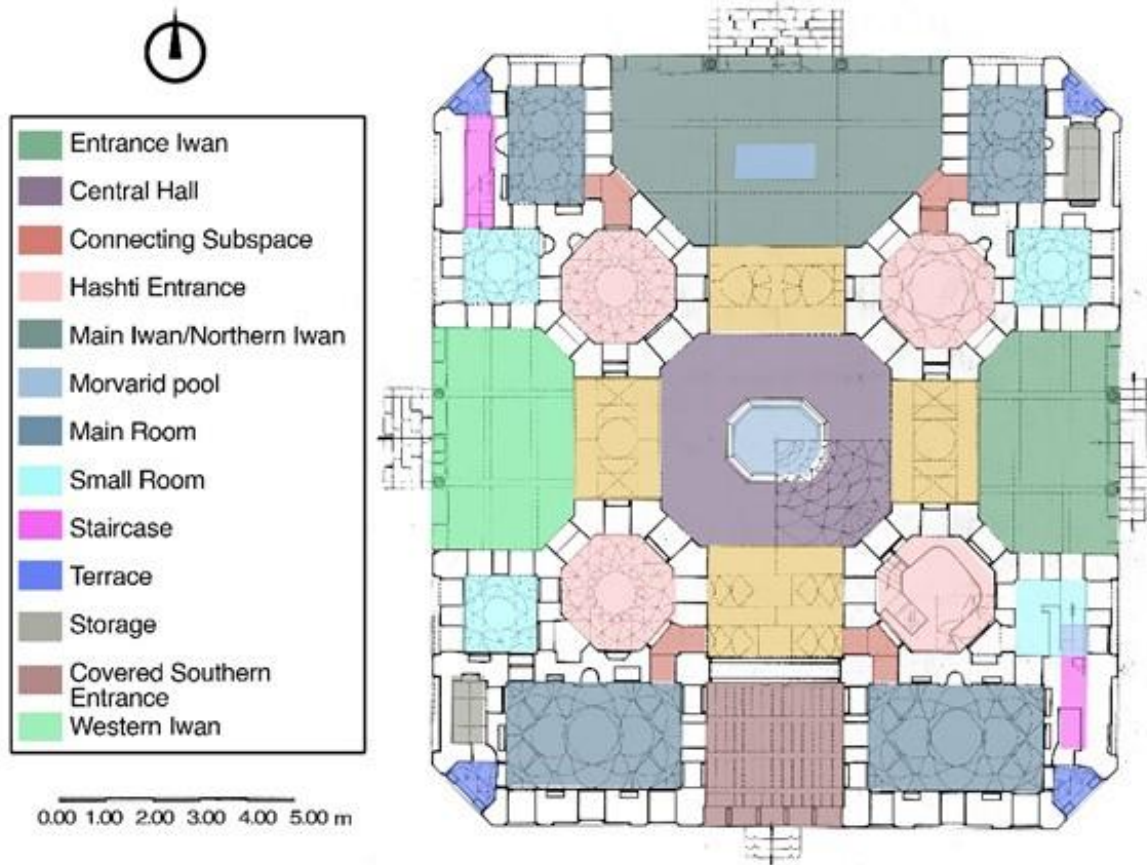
Ground floor plan of Hasht Behesht Palace [85, 131, Authors]
